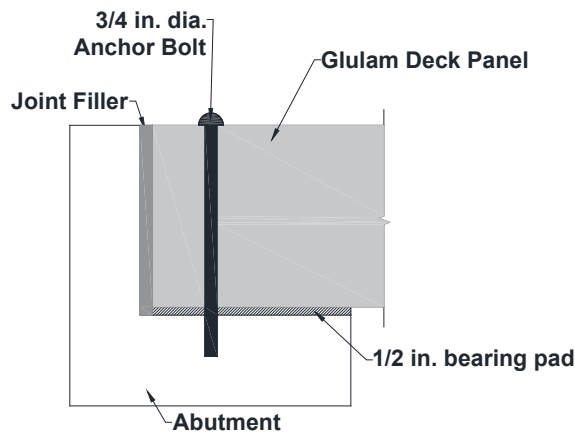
Glulam Slab-to-Abutment Sample Connection
